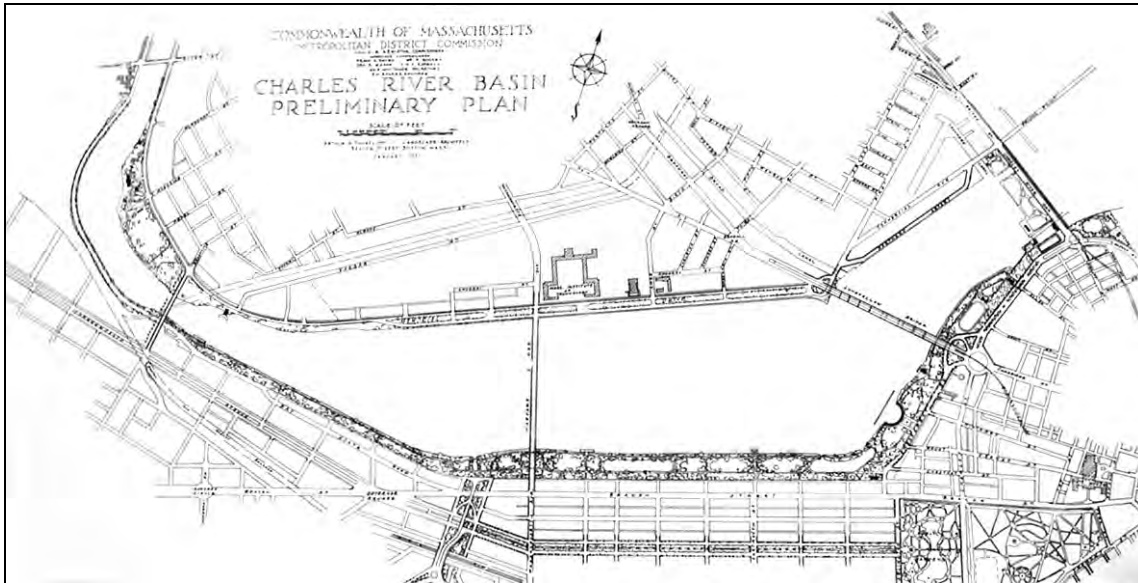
1931 plan by Arthur Shurcliff. The parkway included in Shurcliff's initial plan was eliminated, although Embankment Road behind Beacon Hill was retained and Charles Street adjacent to Charlesbank was widened. The breakwater at the Boat Haven was flat rather than curved in this version and the lagoon had not yet appeared. (DCR archives)
